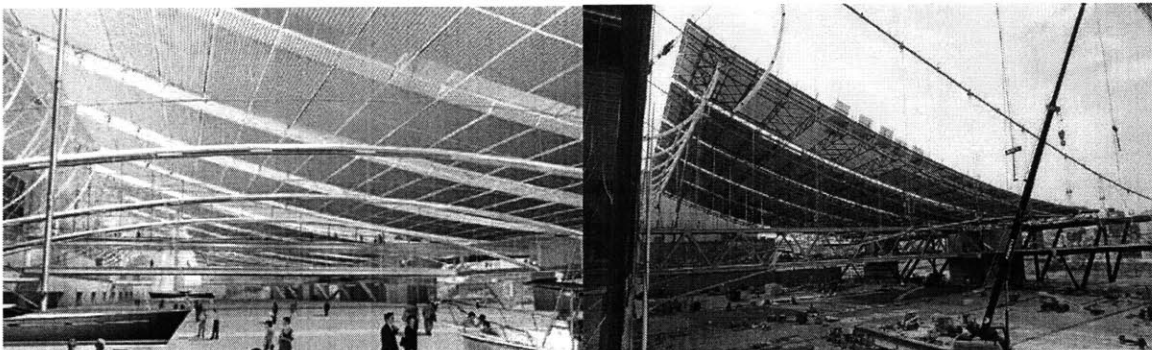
Cable beam and side cable stayed glass façade; an artist rendering and a construction photograph
